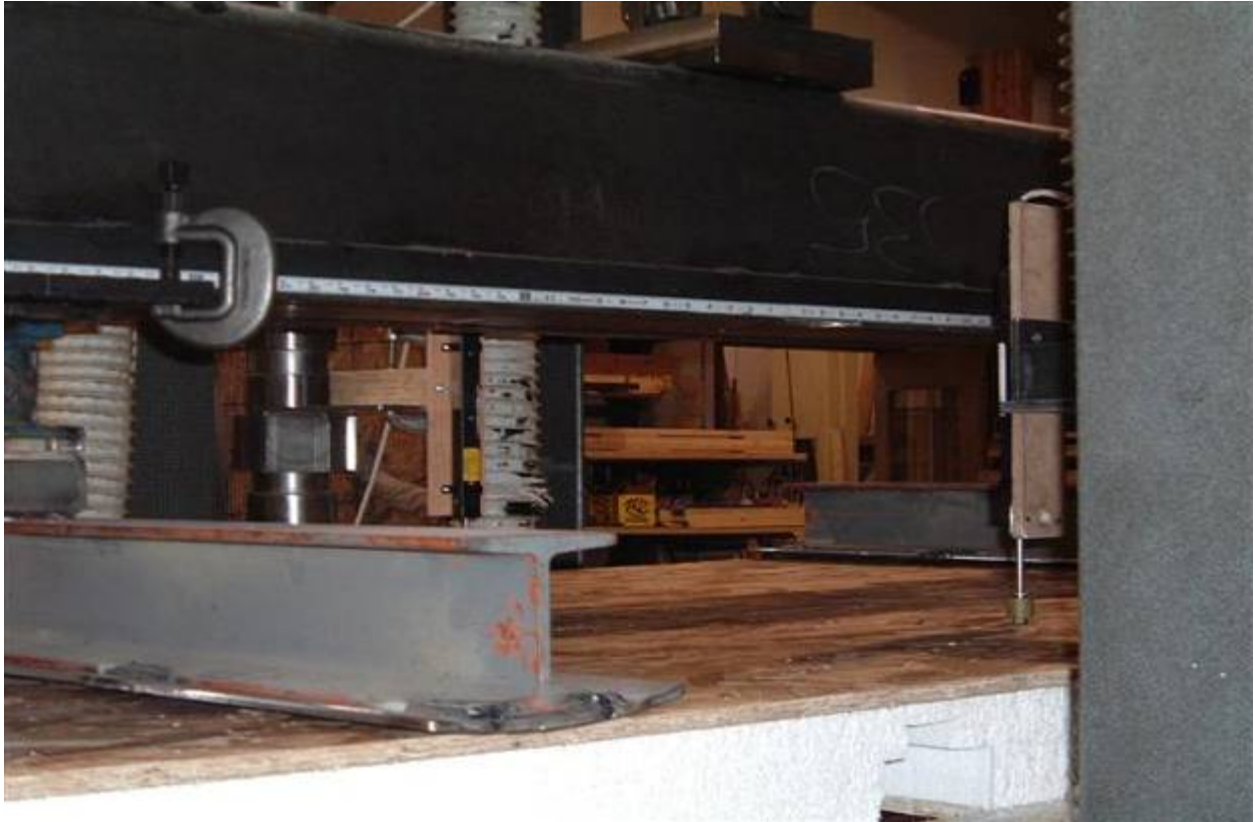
TRANSVERSE LOAD TEST ASSEMBLY –THIRD-POINT LOADING APPARATUS WITH INSTRUMENTATION
